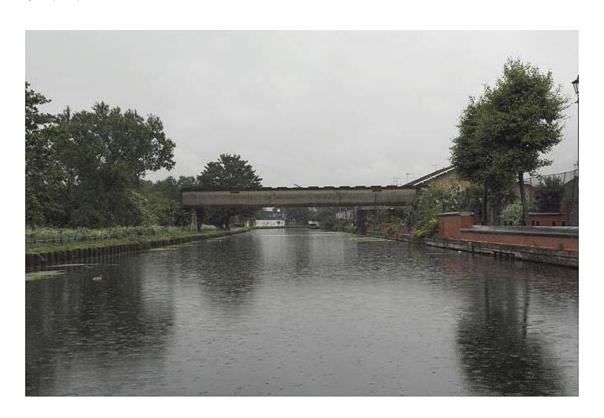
View of Lea Navigation and covered footbridge, looking south: OL-01207
